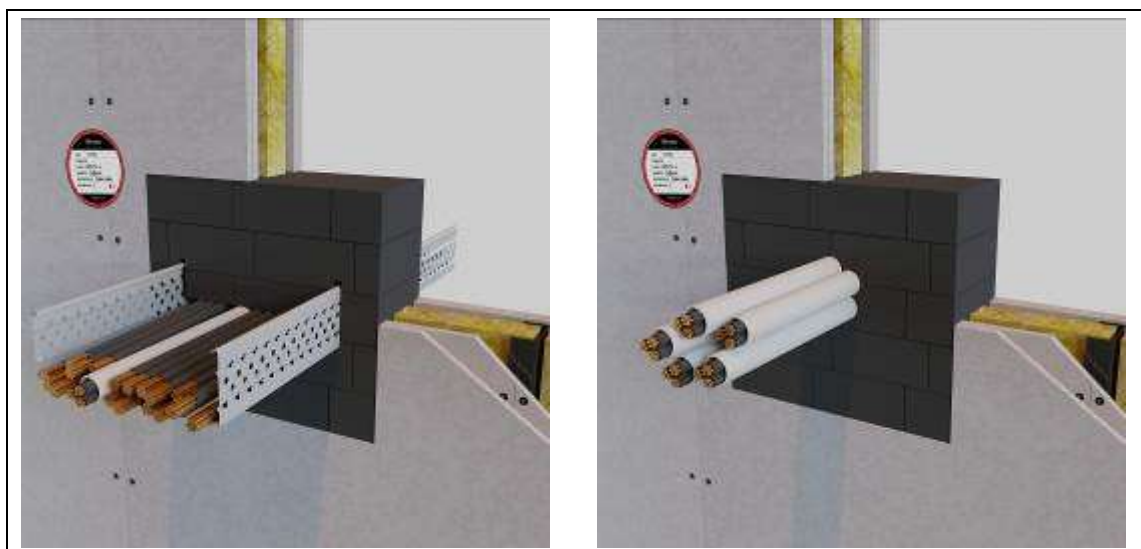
Examples of MASS penetration seal of cables in flexible walls.
